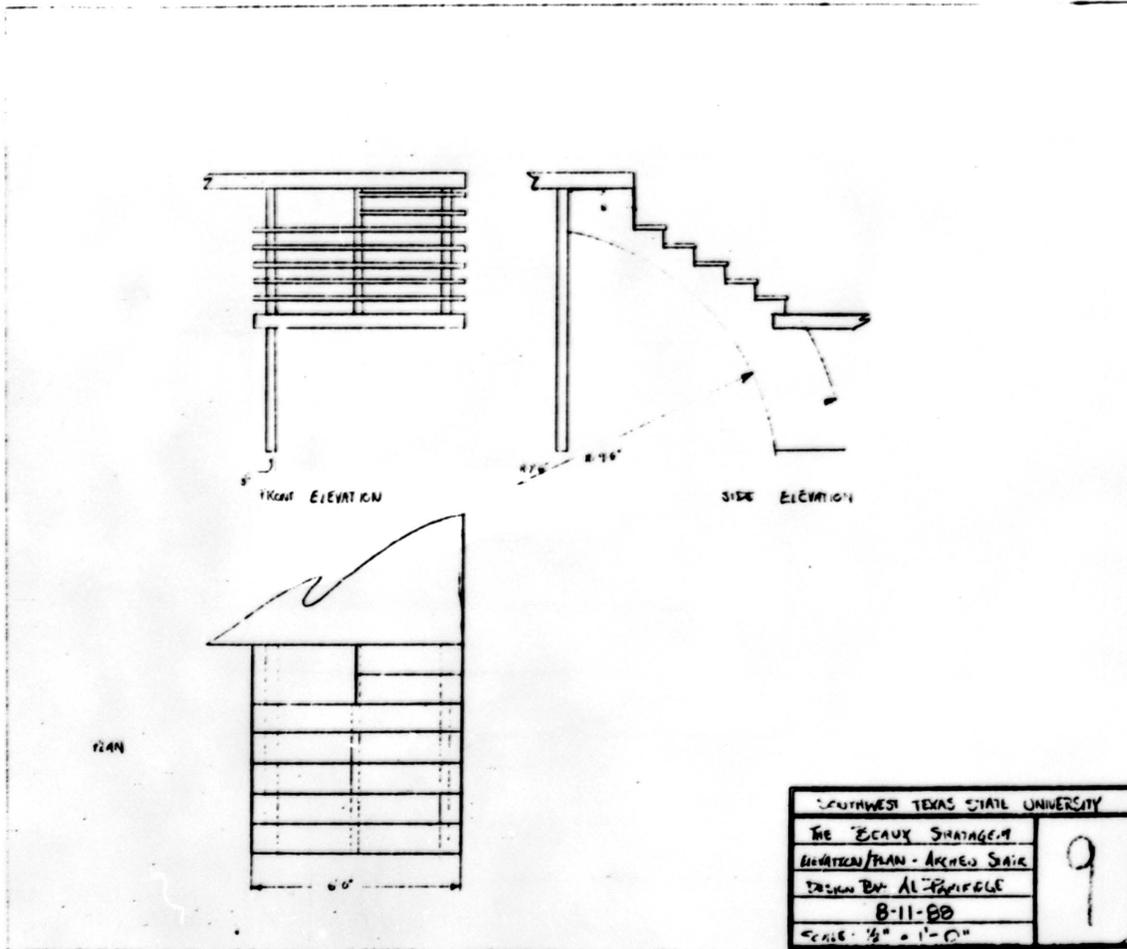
Plate 9, Plan/Elevation Arched Stair.
